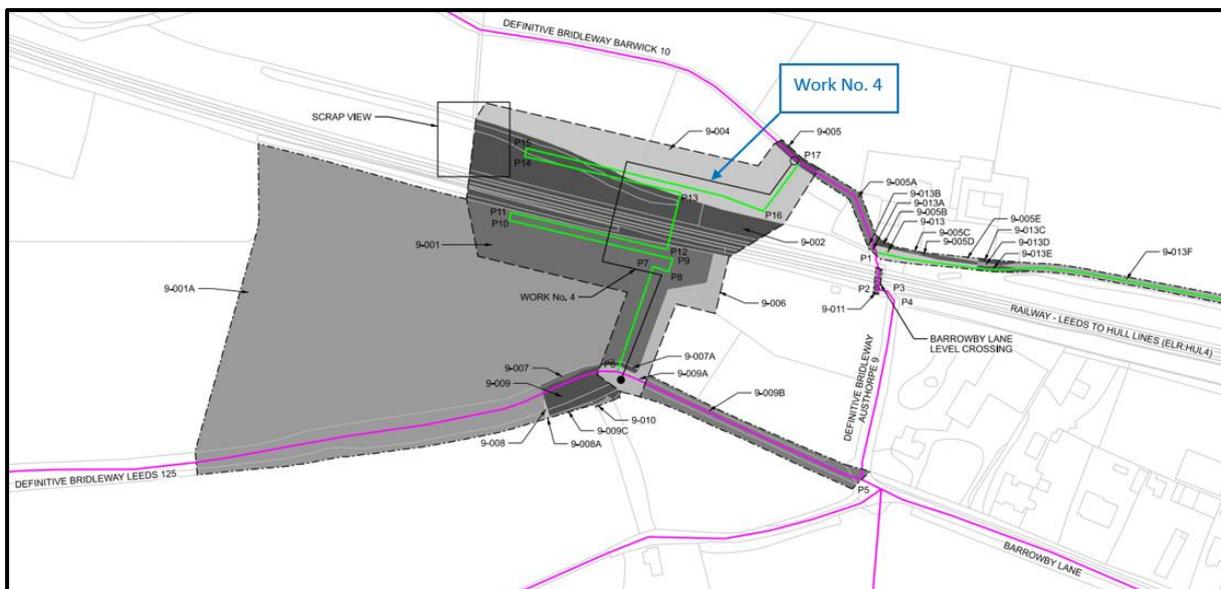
Extract of Works and Land Plan Order Sheet 6 (NR09)
